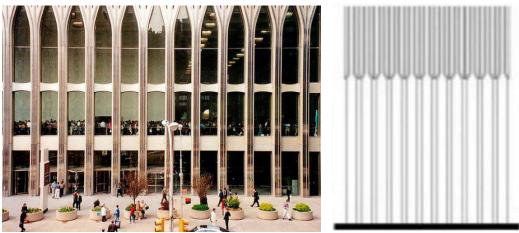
The World Trade Center's Columns on the Lower Foors Merged to Provide Enough Area for the Entrance
